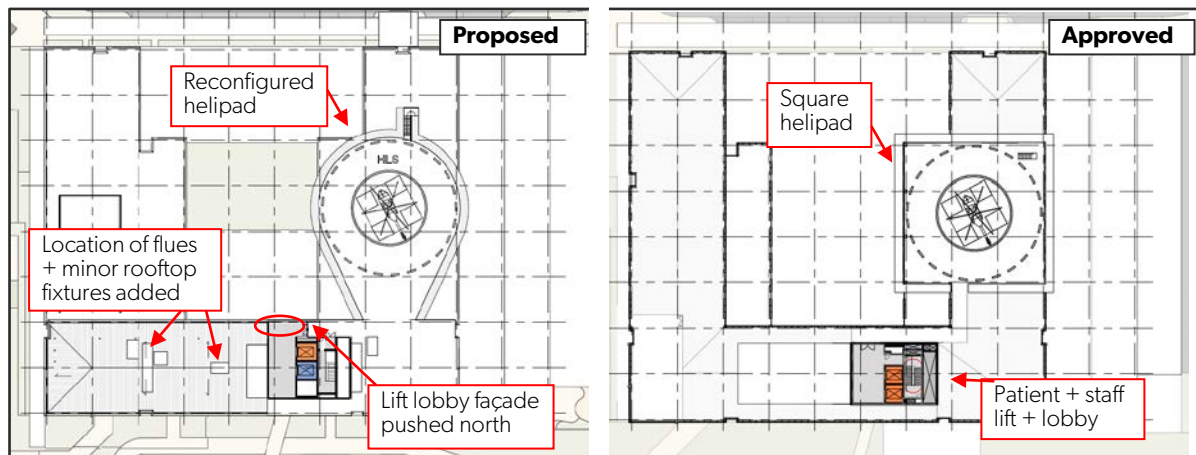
| Proposed (left) and approved (right) Level 14 floor plan (Source: Modification Application)
